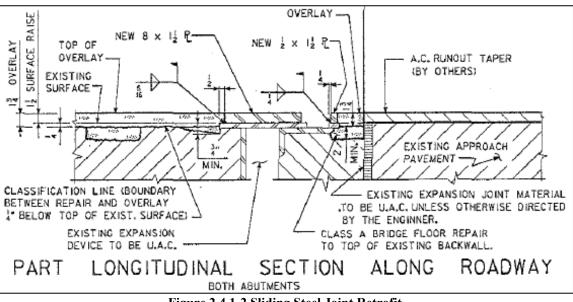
Sliding Steel Joint Retrofit
